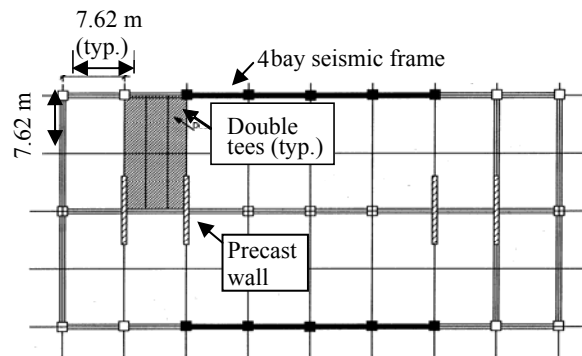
Plan view of the precast concrete prototype building (Nakaki et al. 1999)
